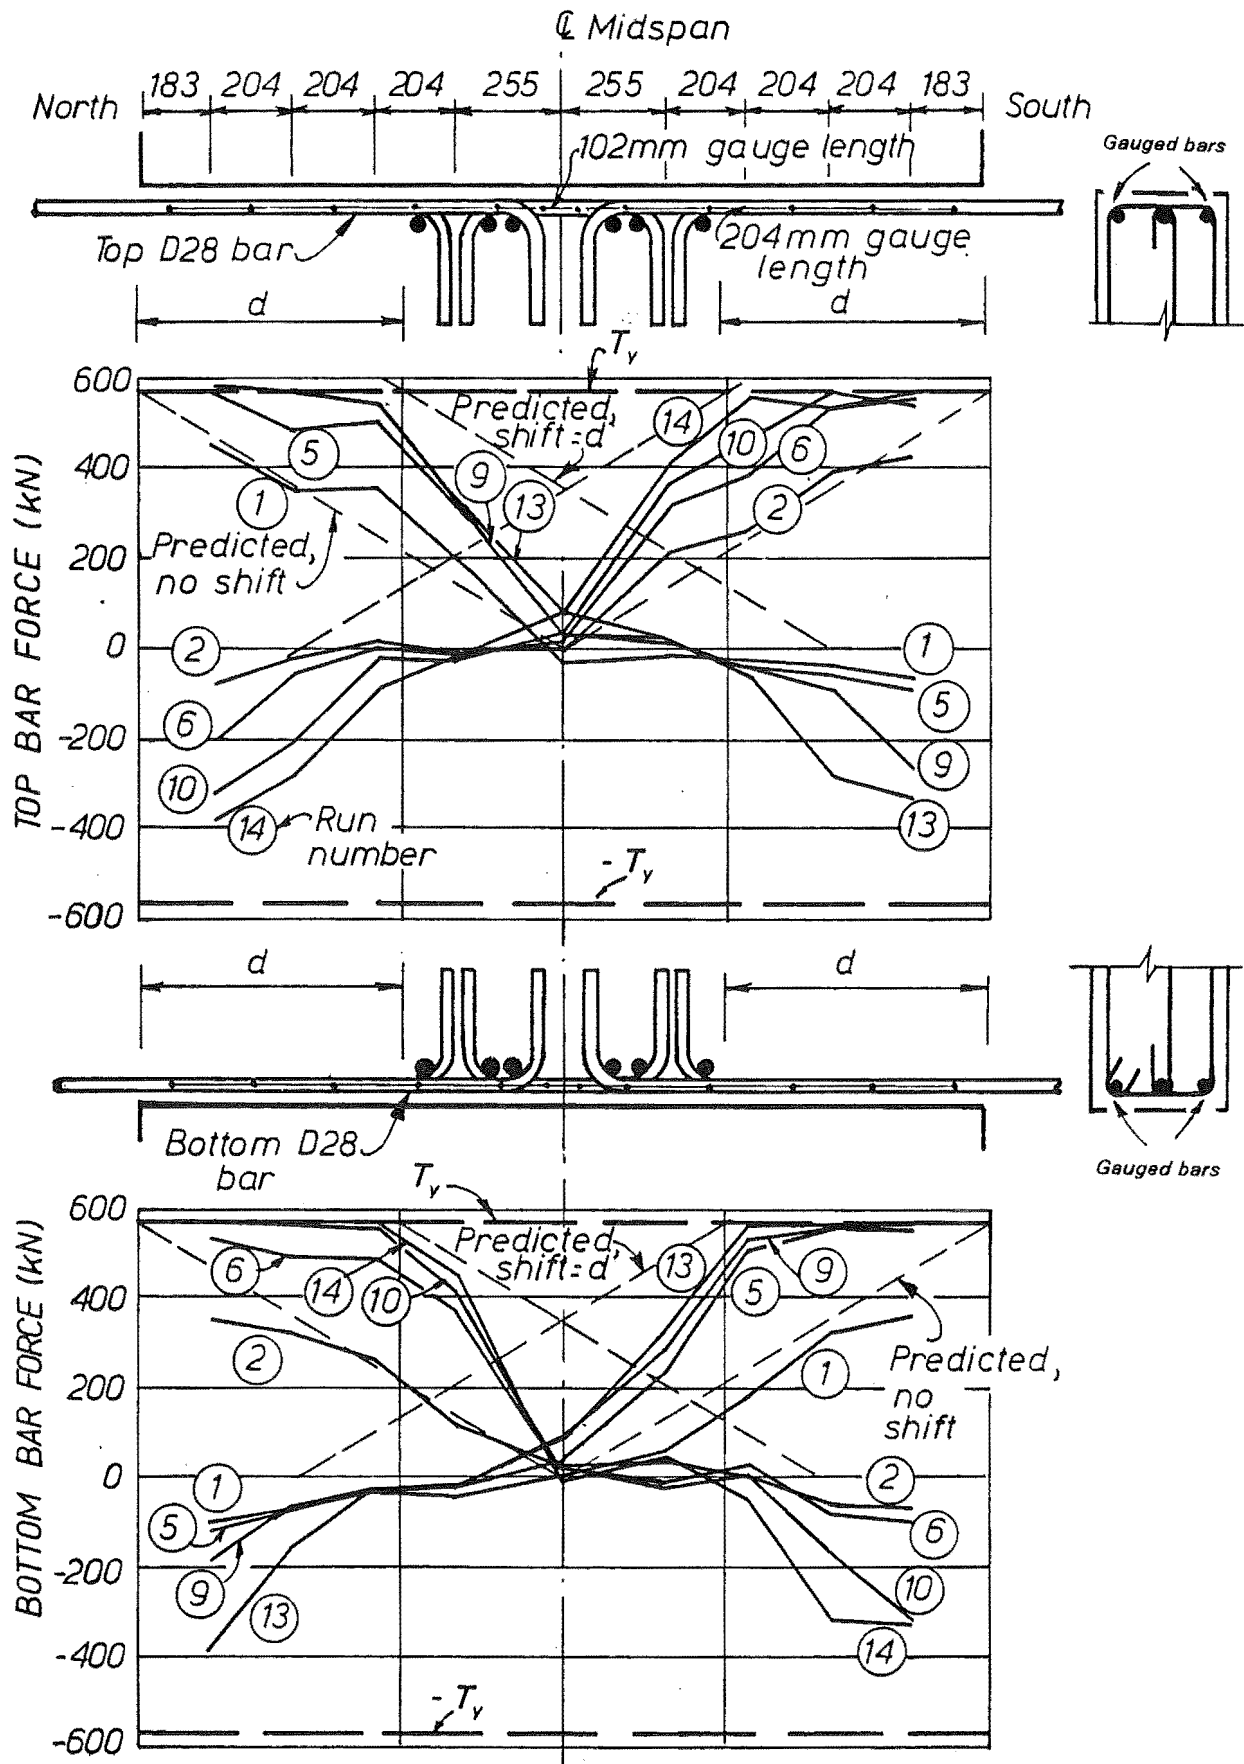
Longitudinal Bar Forces in the Beam of Unit 2.
